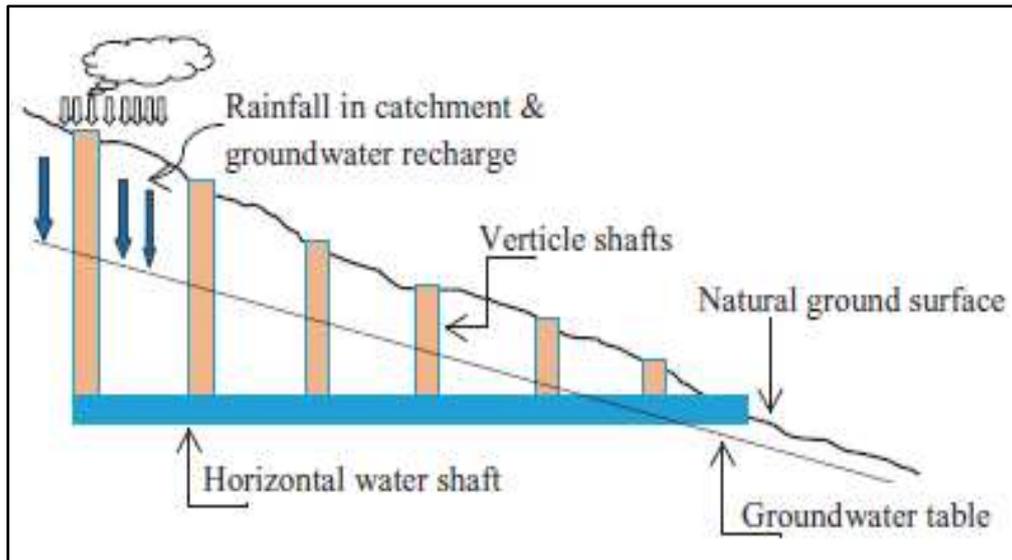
5 Groundwater Harvesting Qanat. (Source: Cech 2009)
